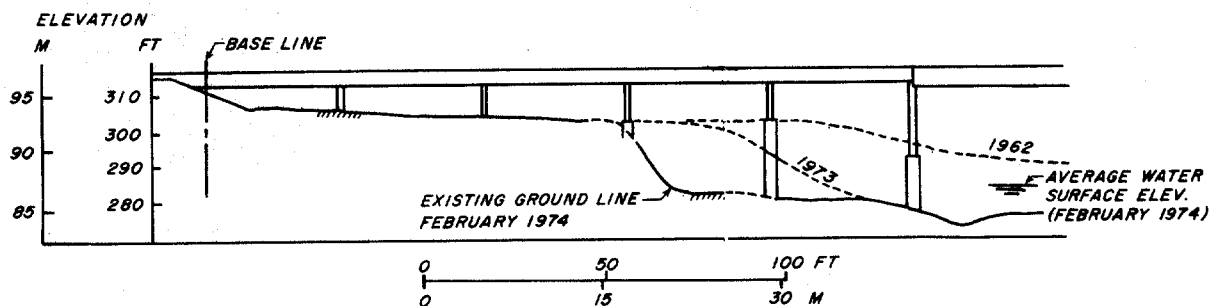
Cross section showing lateral erosion of left bank at SR-41 bridge. (From a survey made in 1974 by Arkansas Dept. of Highways.)
